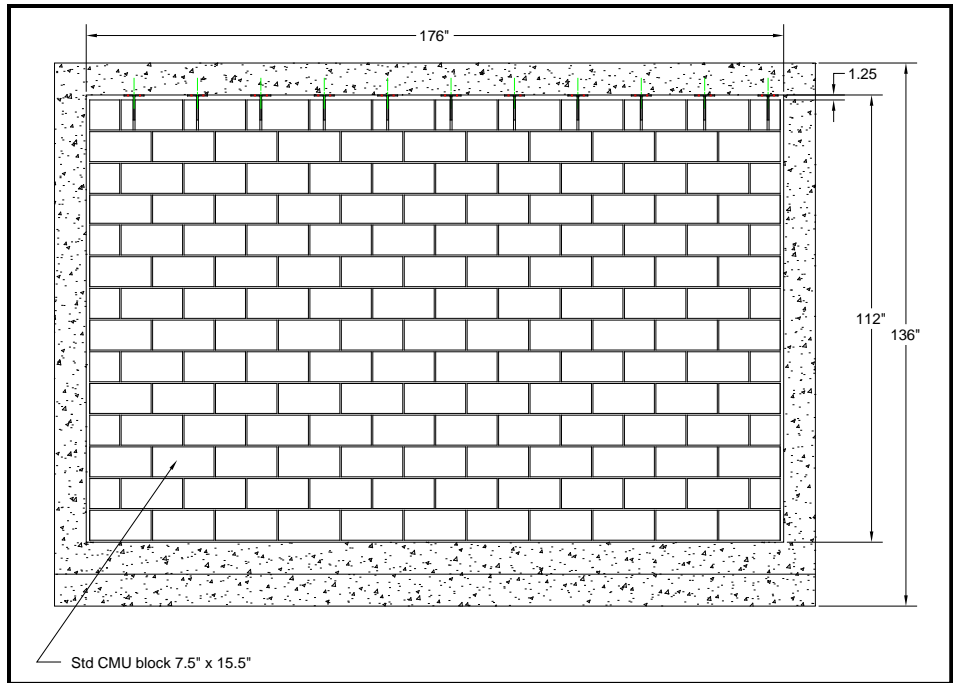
Typical CMU wall construction details for Bays 3 and 4.
